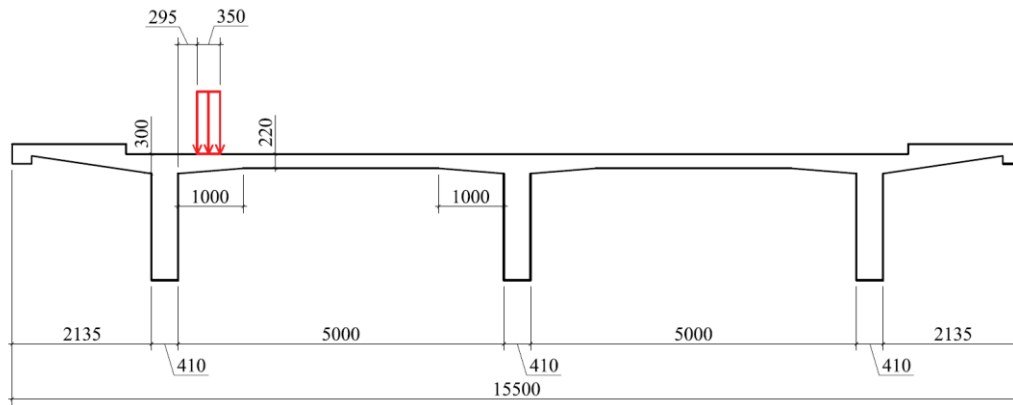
Cross section I including further loading point; all dimensions are in mm.
